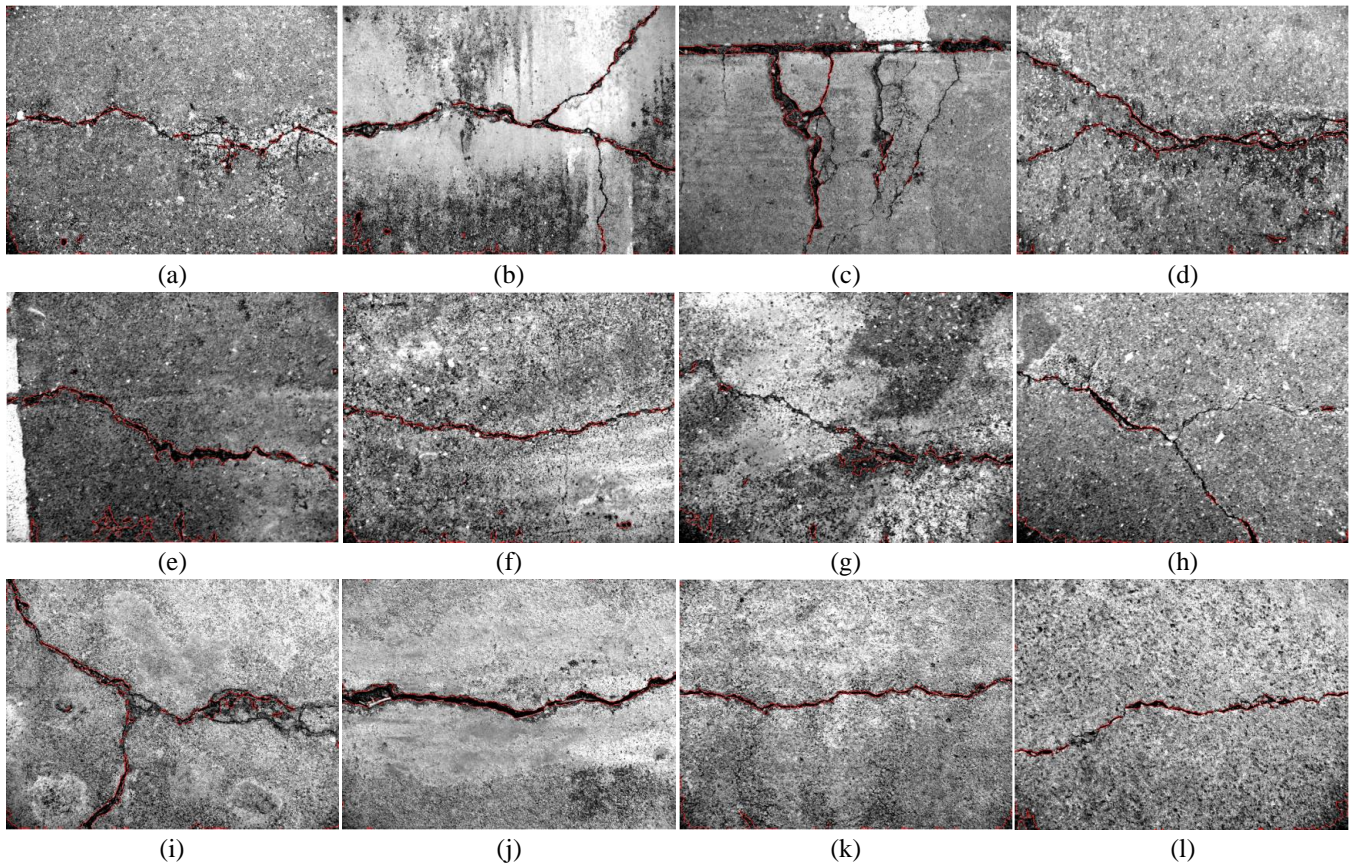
Segmentation result of concrete pavement cracks using MSED-II
